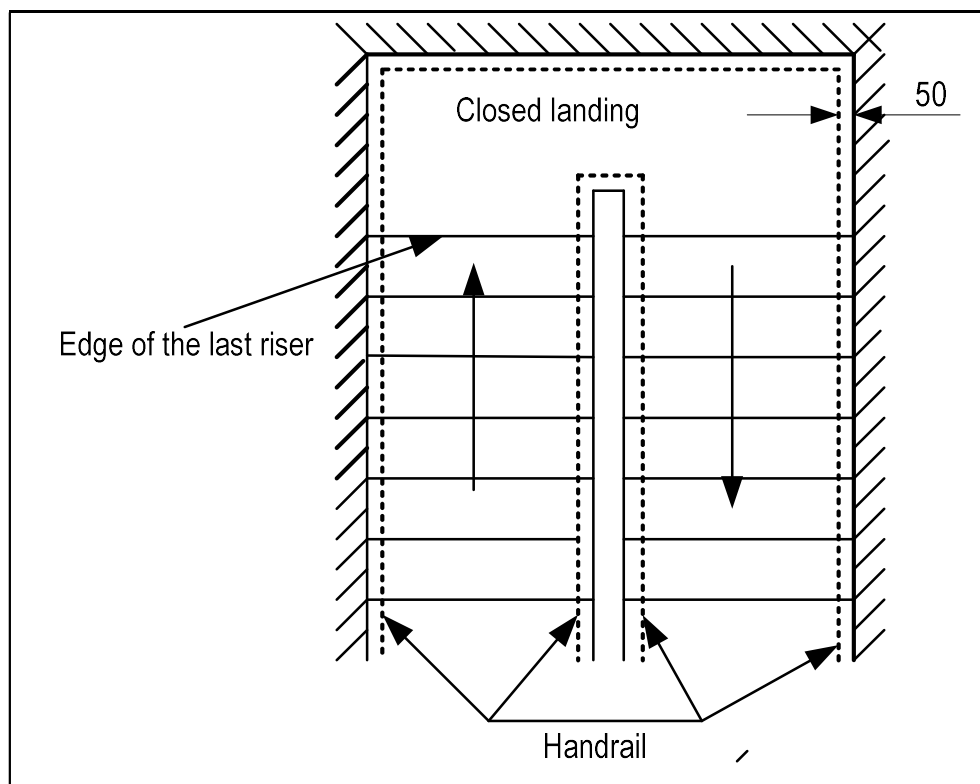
Plan of installation of an enclosed stairway with handrails all around (TGSi not required)
